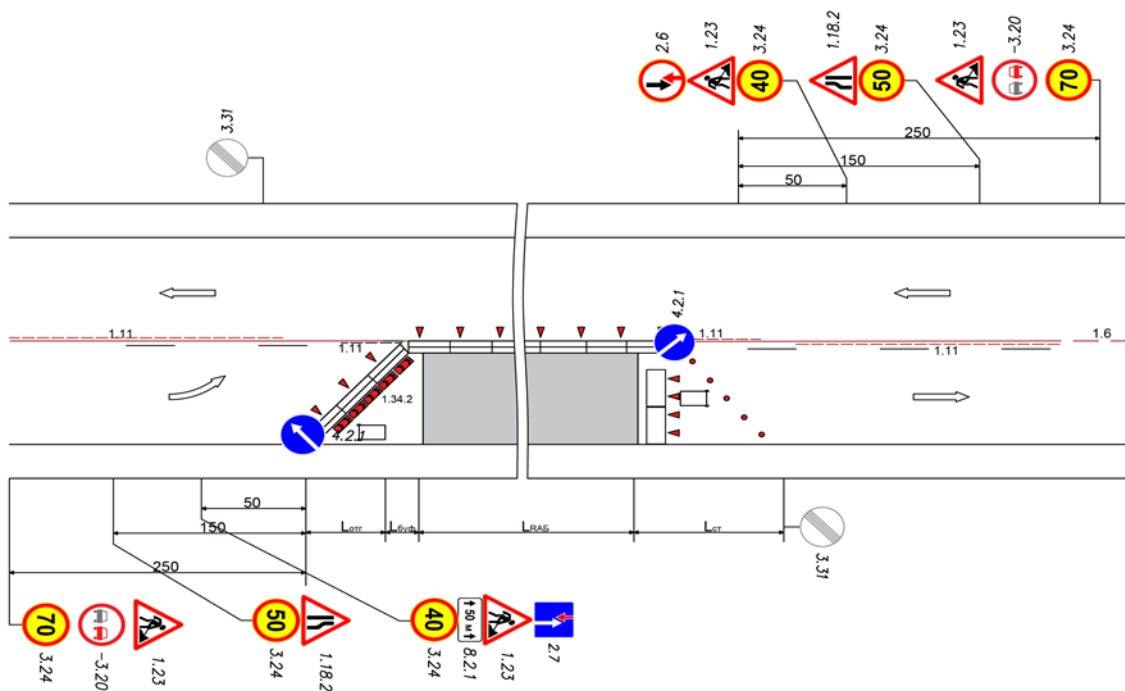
Scheme of traffic organization and equipment of road barriers on the road section where repair works are carried out on half of the two-lane road.
